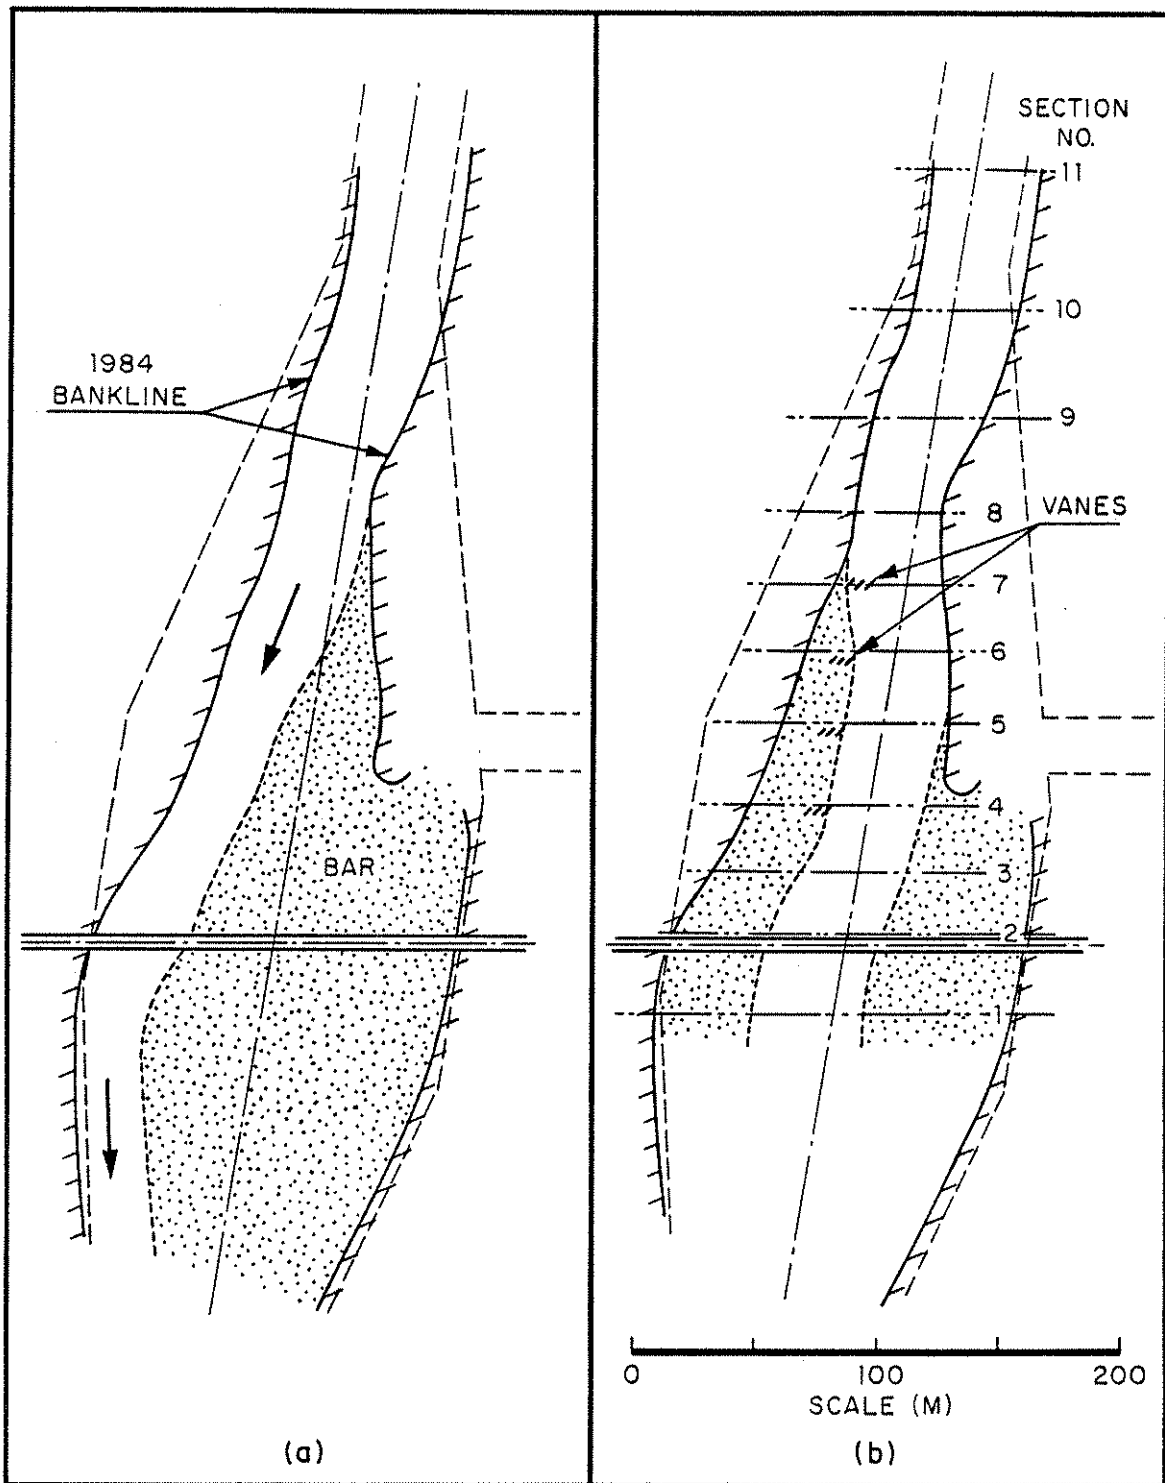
Plan of West Fork Cedar River bridge crossing (a) prior to vane installation in 1984 and (b) in 1989 five years after vane installation. Plan (b) shows location of vanes and survey sections.
